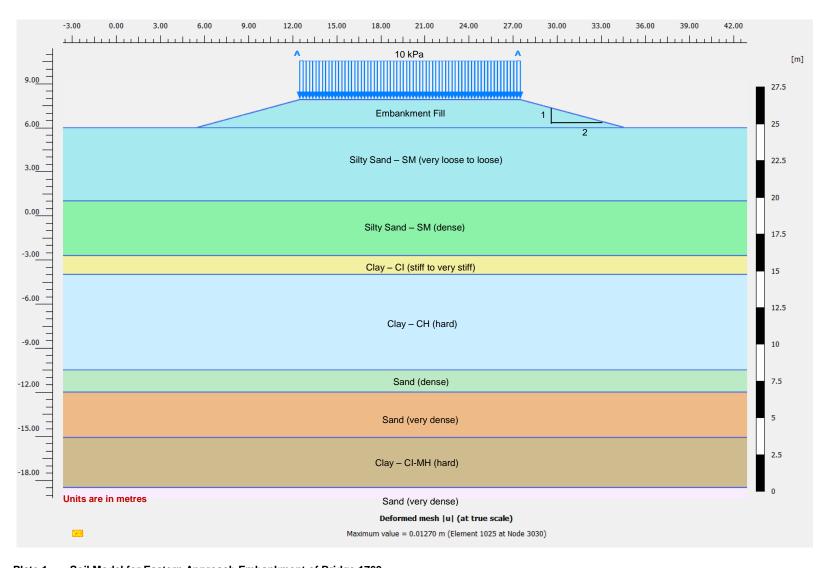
Soil Model for Eastern Approach Embankment of Bridge 1763
